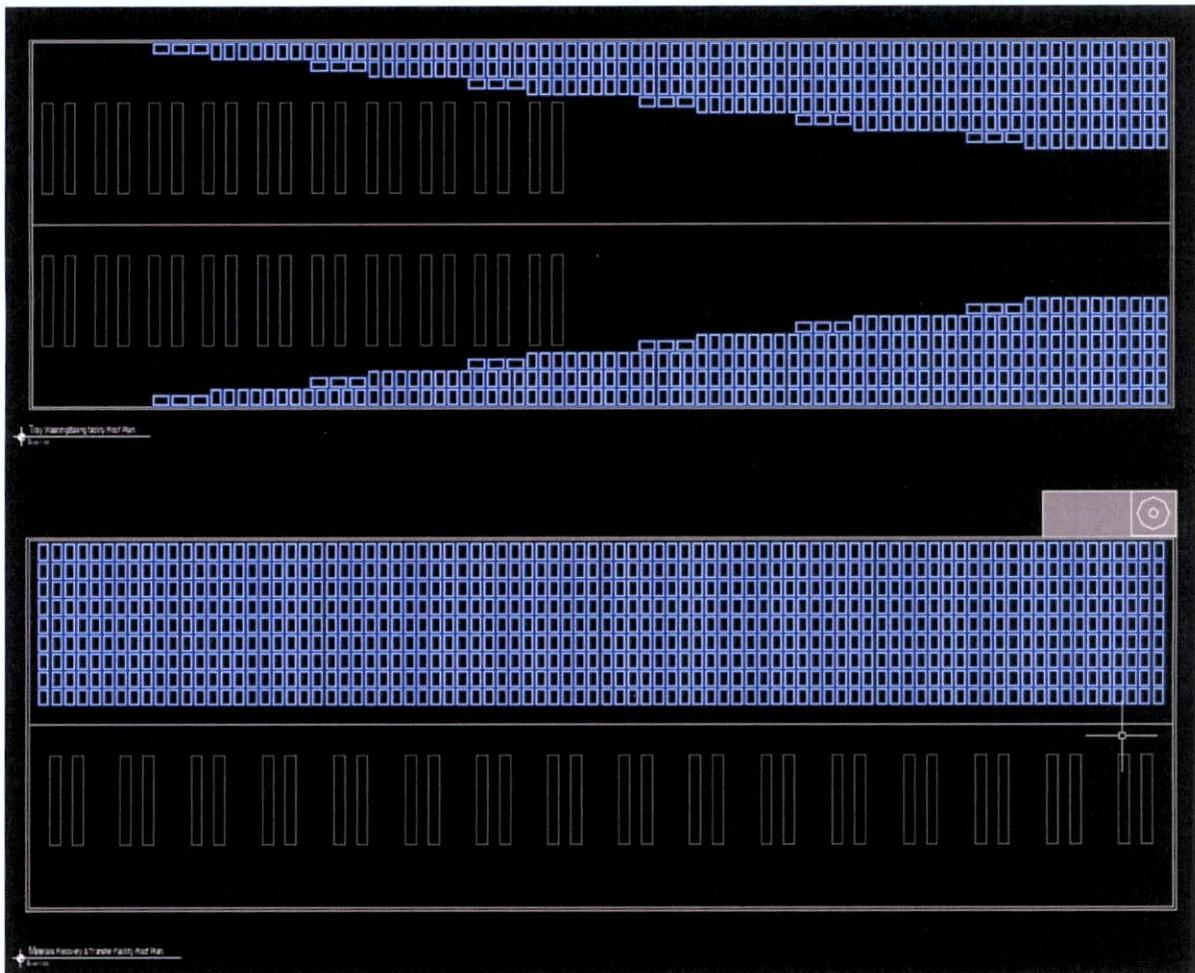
Extract from drawing "22-039 S Industrial units REV E.dwg" showing the proposed roof layouts of with the proposed PV panels (blue).
